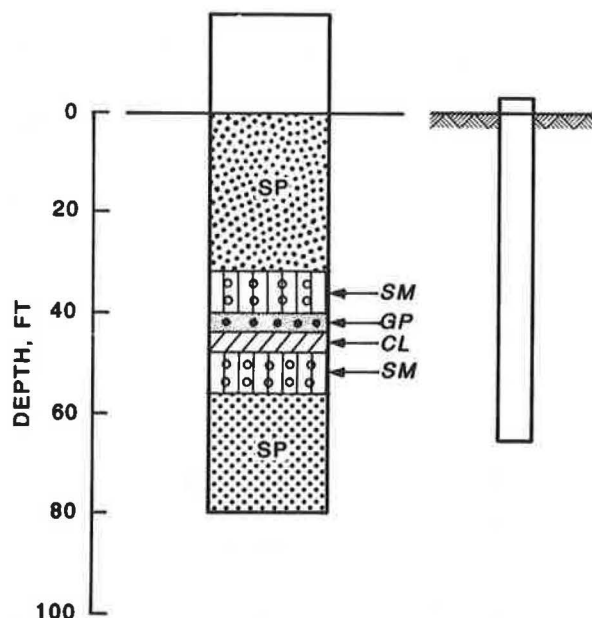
Generalized soil profile at Lock and Dam No. 4 pile test site.
